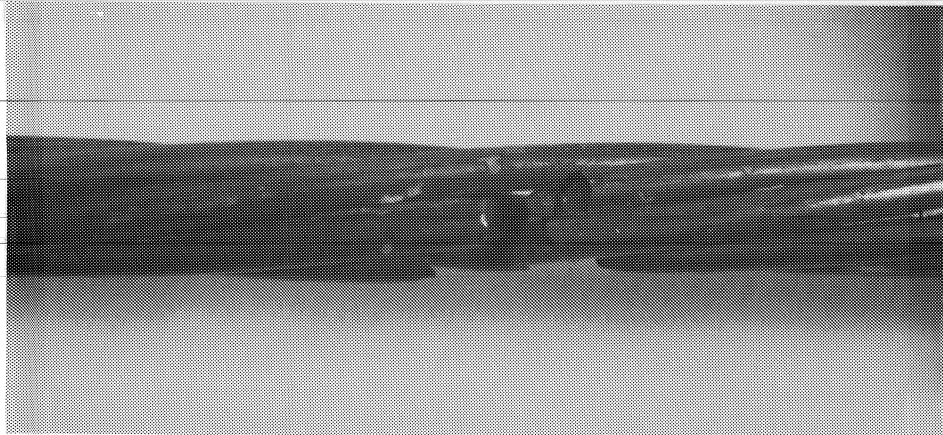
Fretting Fractures of Wires of Specimen P-M-1-25
